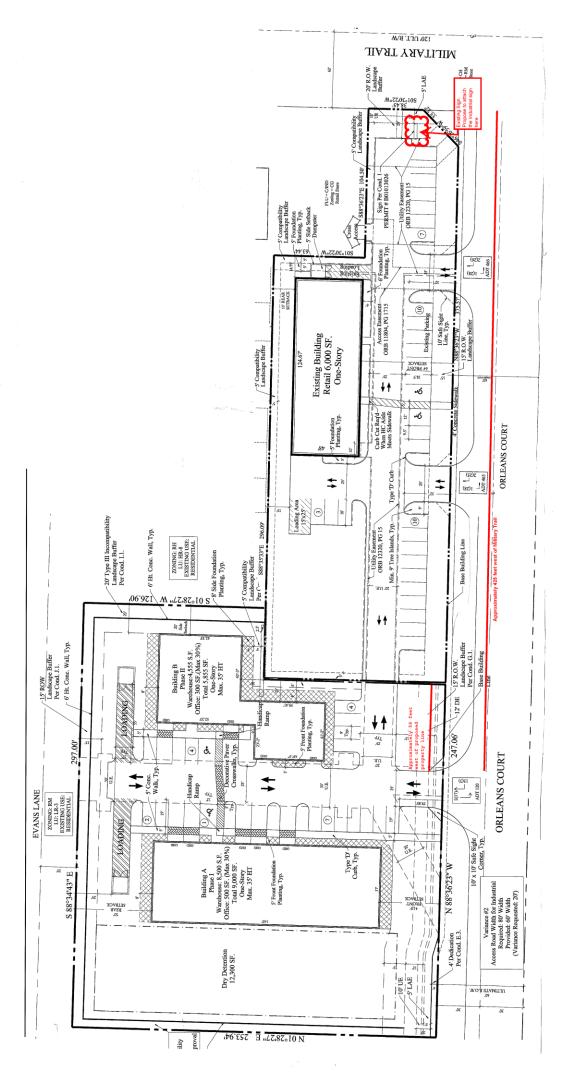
Commercial and Industrial Combined Site Plan showing existing sign location
